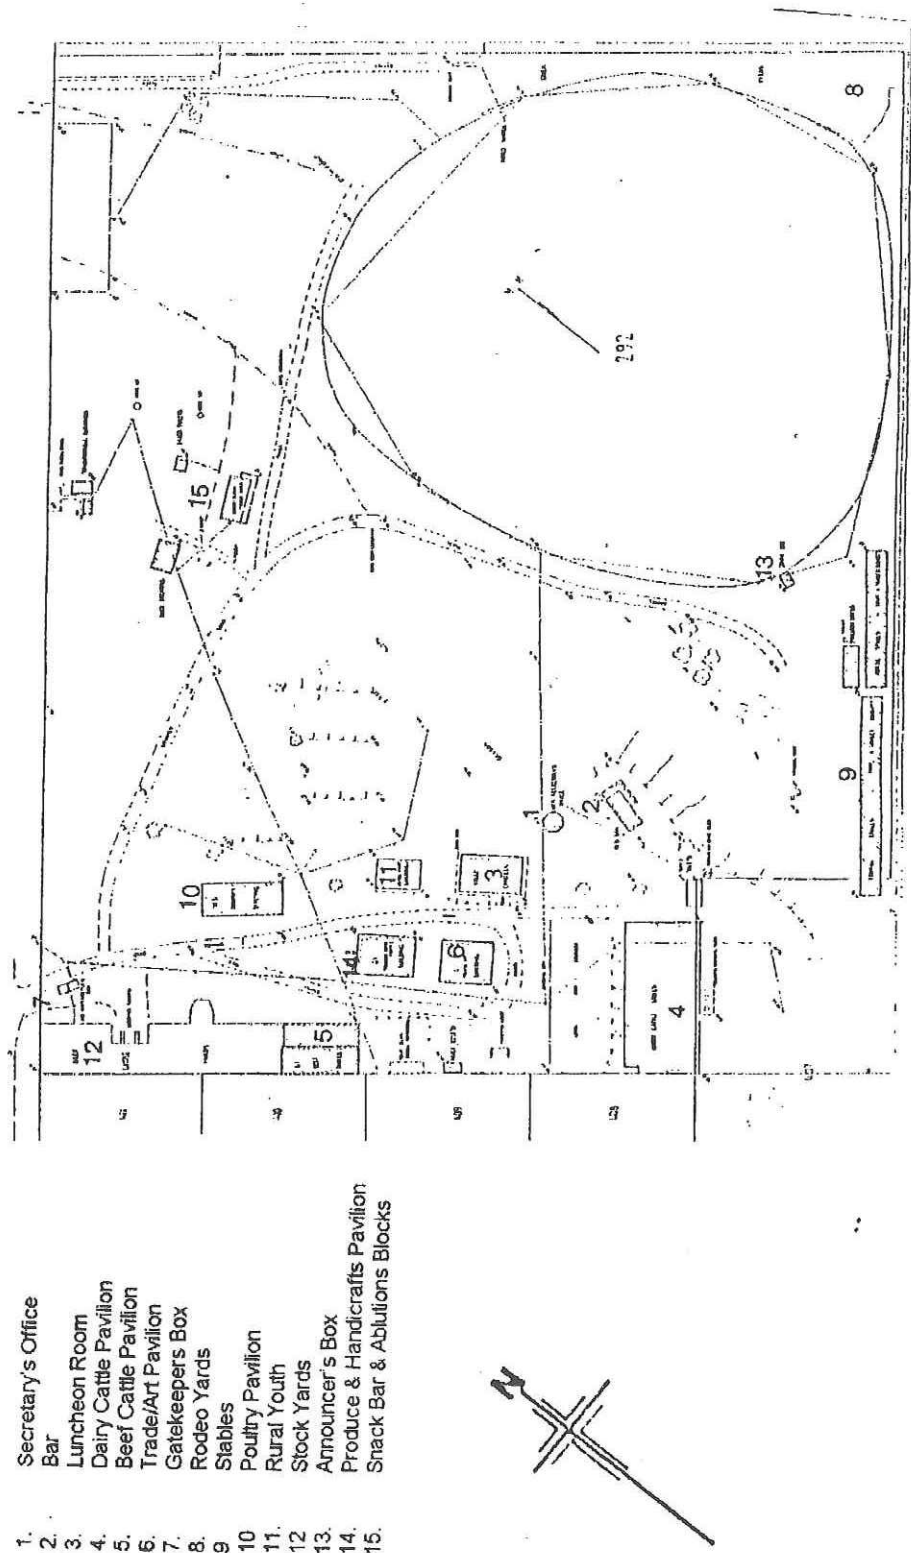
PLAN OF GLOUCESTER SHOWGROUND
